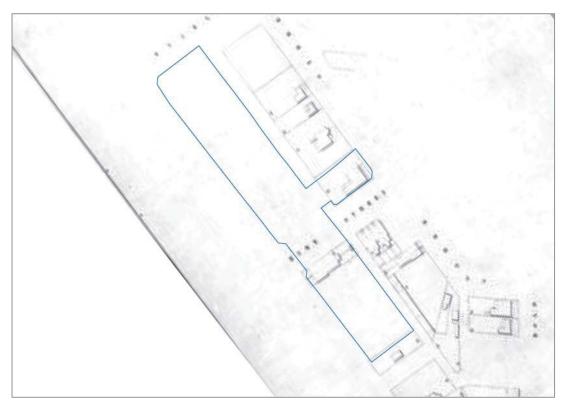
1909 Subdivision plan on Lane Cove Road showing early residential structures. Crows Nest Station site marked in blue. Source: National Library of Australia
